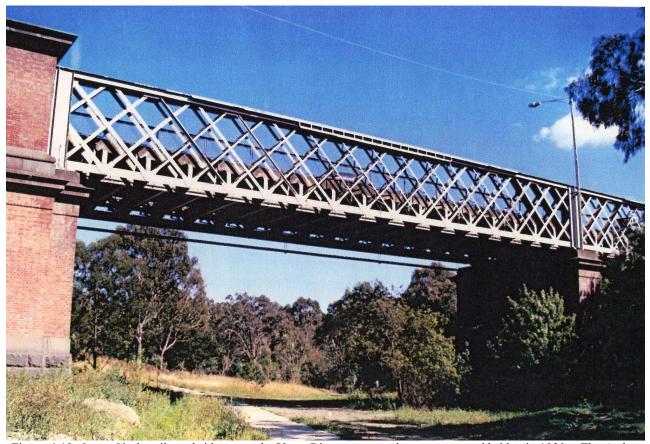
Outer Circle railway bridge over the Yarra River, converted to use as a road bridge in 1930 The Author
